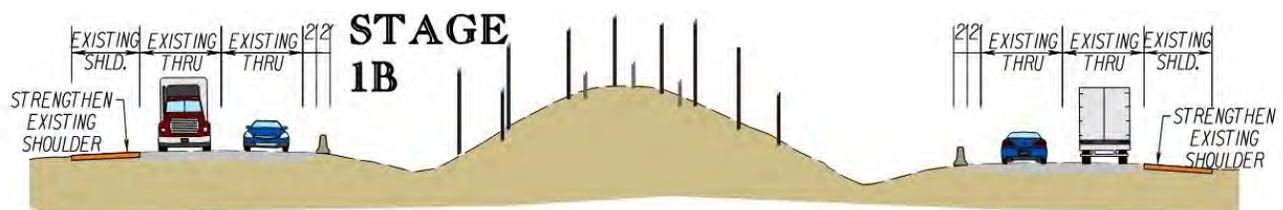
Stage 1B - Strengthen Outside Shoulders
